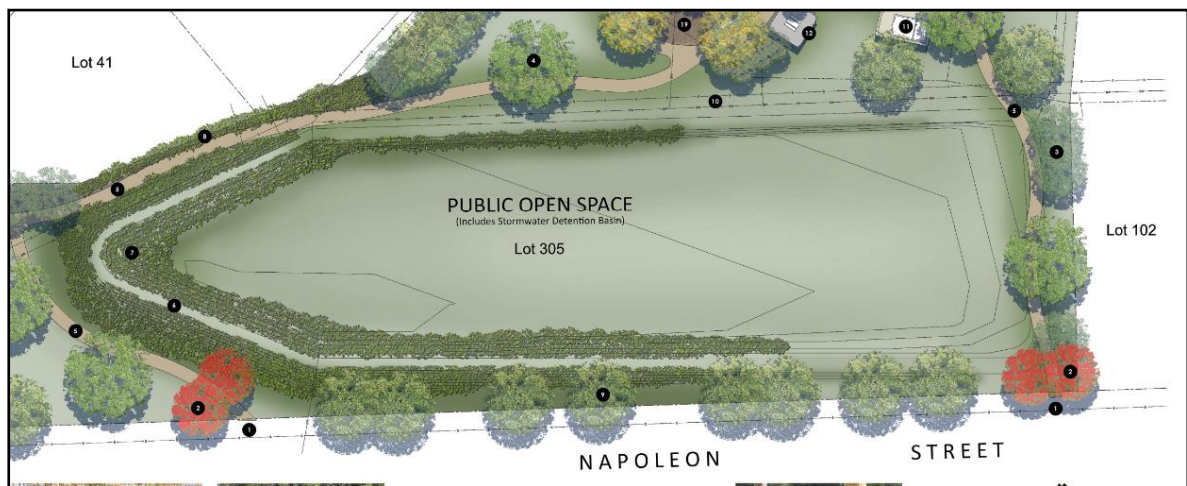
Close up of detention basin from Napoleon Street Park Concept Plan showing accessibility
